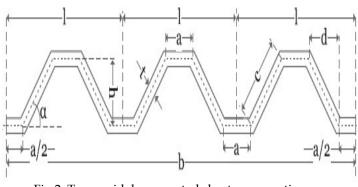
Trapezoidal corrugated sheet cross-section and dimension notations <sup>[3]</sup>
